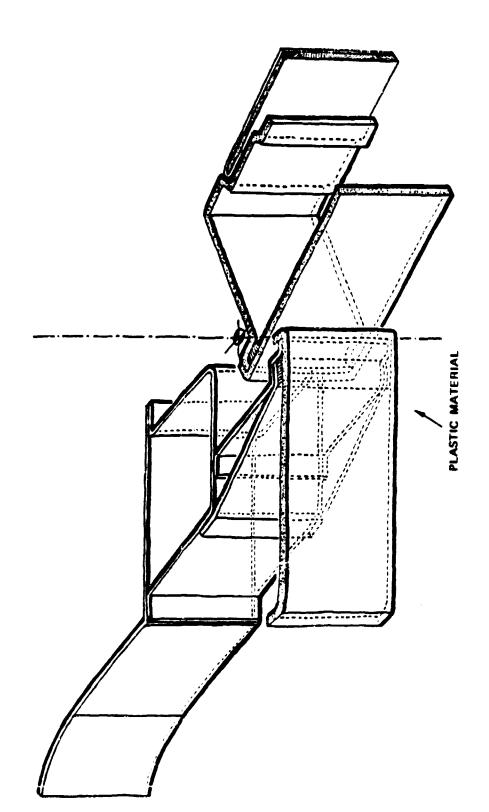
ROOF AND SIDE DOOR CROSS SECTION
